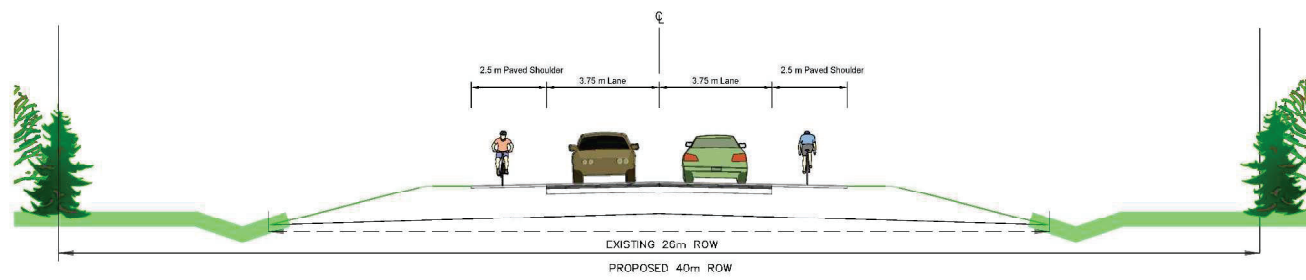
Section 2 Alternative 1 - 2-Lane Rural Cross Section
